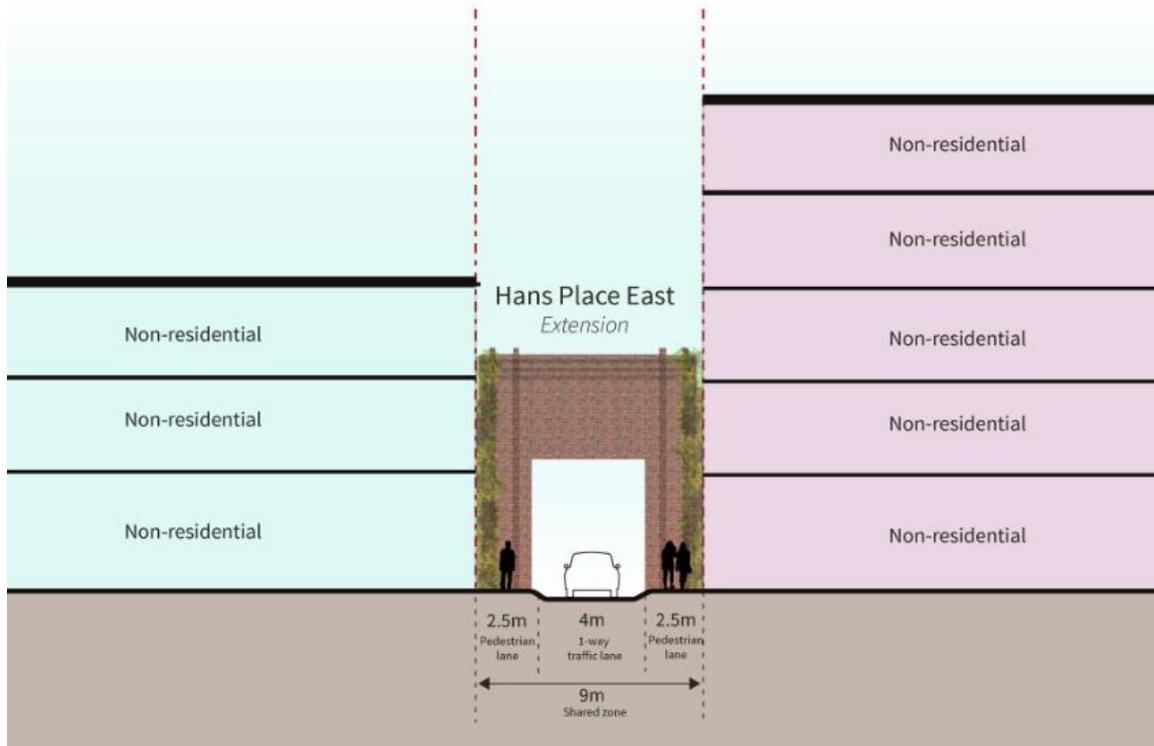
Street section 8 – Road extension of Hans Place East (Shared zone)
